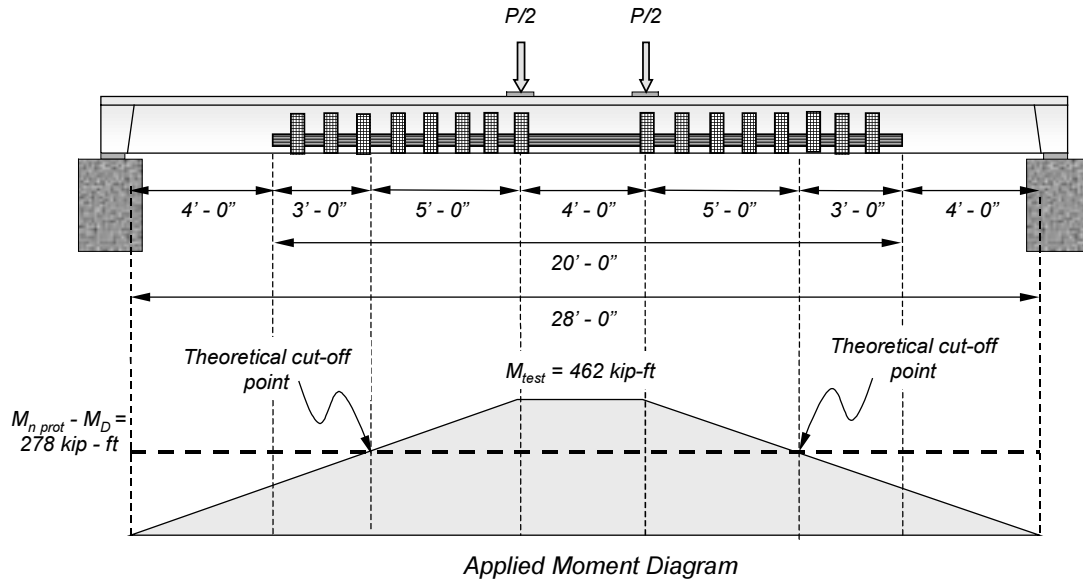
CFRP Strengthening Details for Specimen J-1
